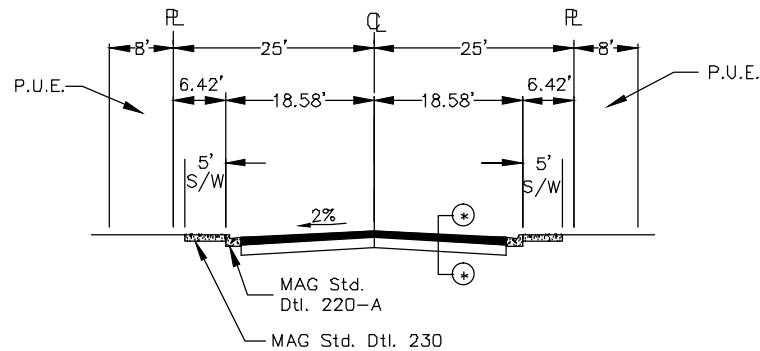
CITY OF GOODYEAR STANDARD DETAIL	APPROVED:08/17	MINOR COLLECTOR STREET WITH ON-STREET PARKING	DETAIL NO. G-3124-2
